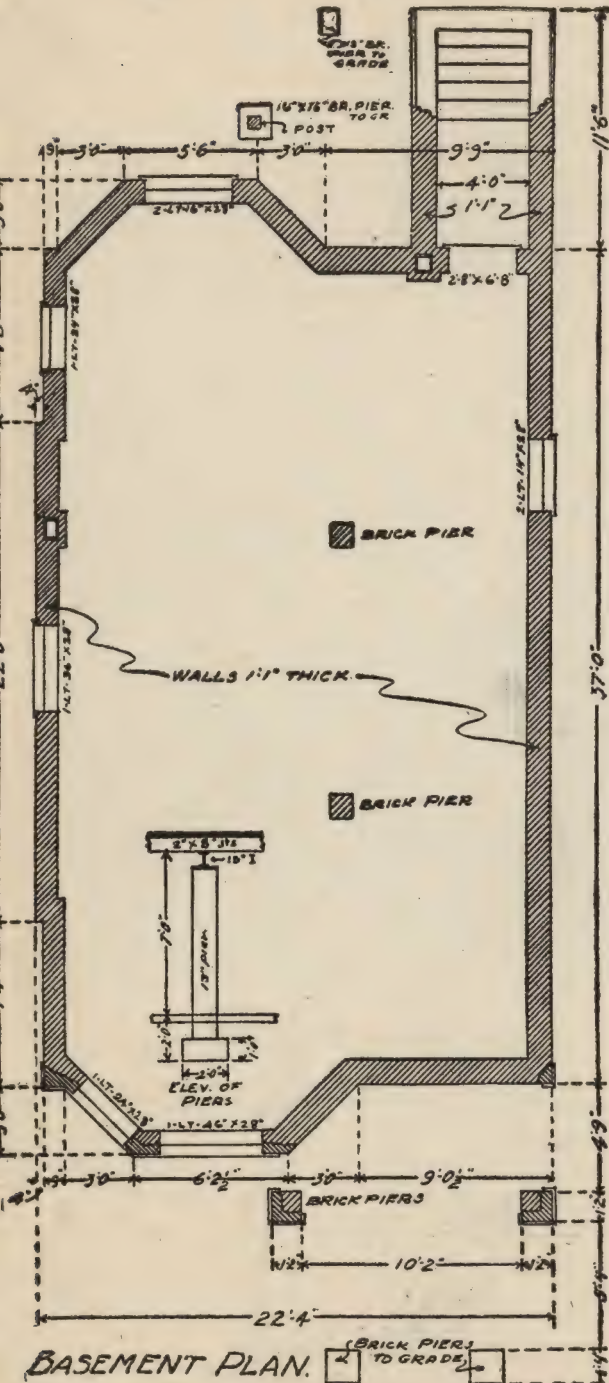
Basement Plan of Brick House Shown in Figs. 62 and 64.
